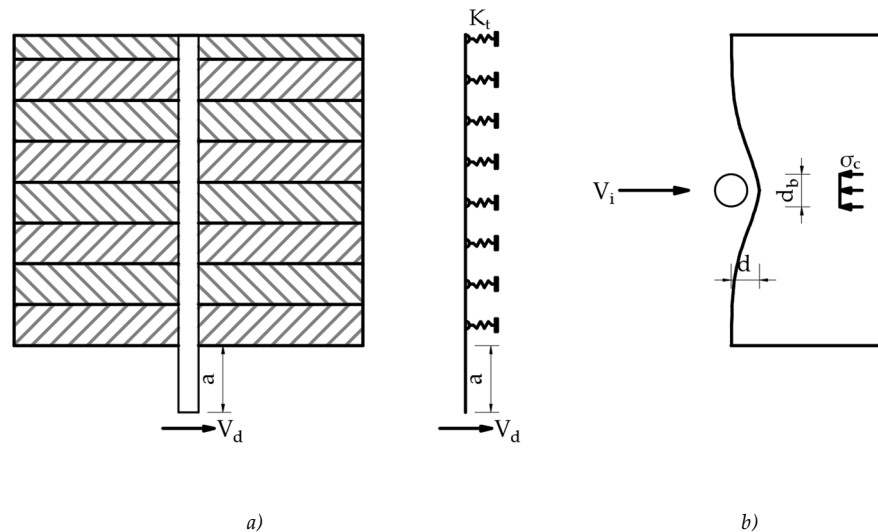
Schematization of the concrete around the dowel rebar: EBEB model a) and concrete layer plate under local horizontal force b).
